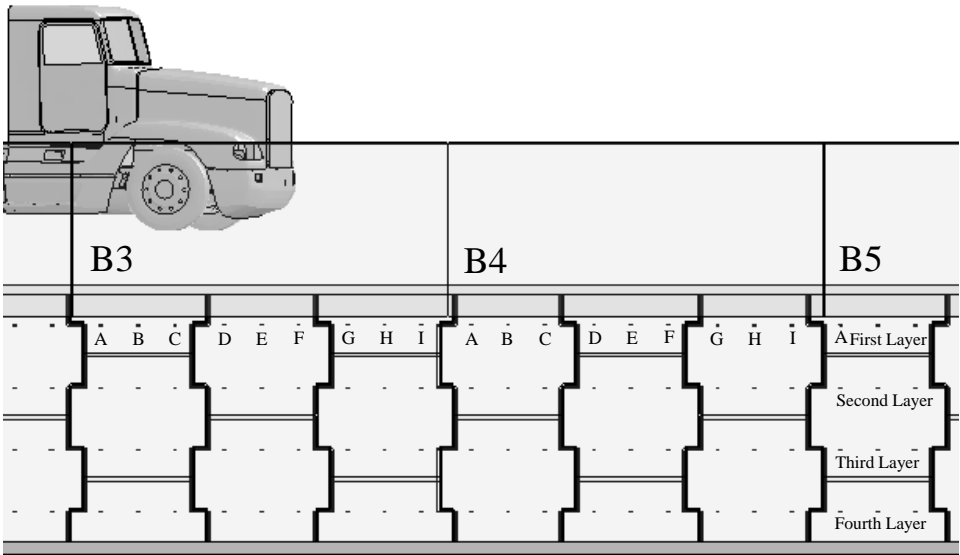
Elevation view of the test wall installation showing the distribution of the strips
